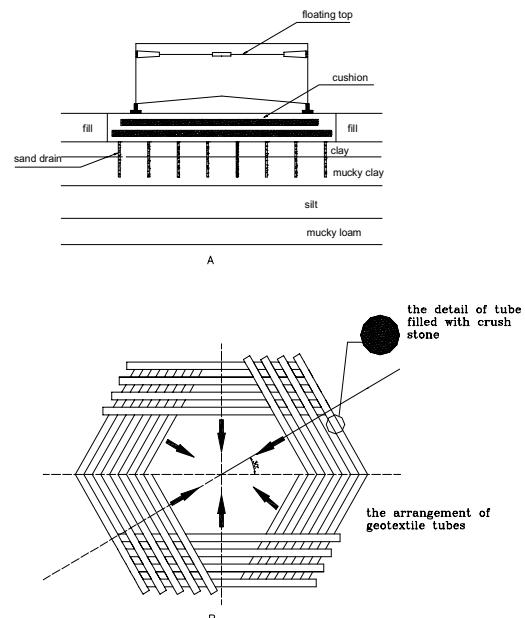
The profile of oil tank and the arrangement of geotextile tubes
